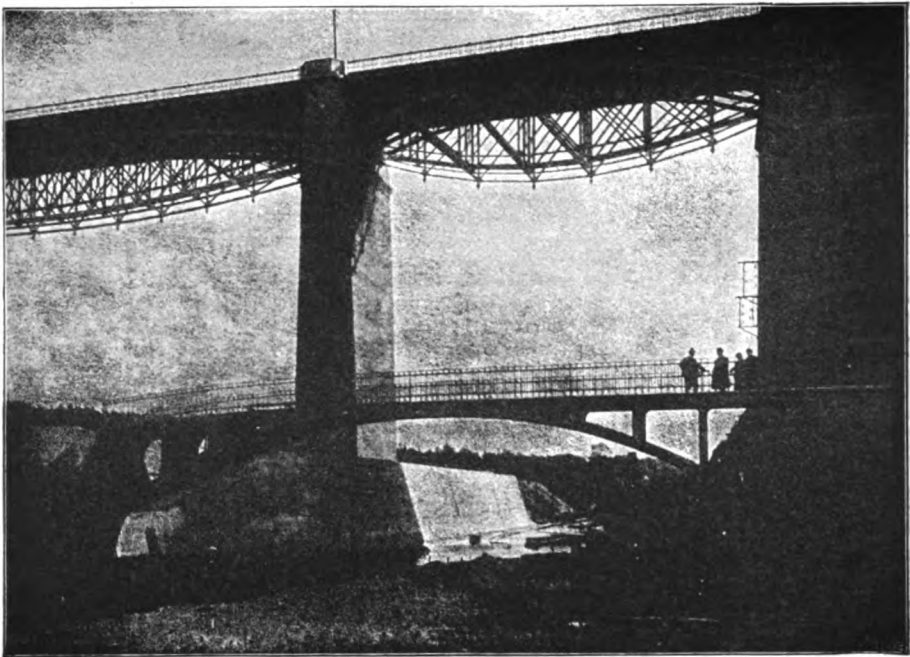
Foot bridge over the traffic canal of the water works for the city of Munich.
